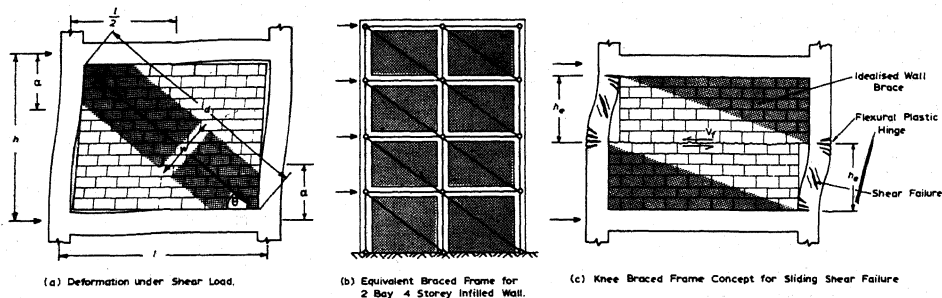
Behaviour of Masonry Infilled Frames Under Lateral Load
